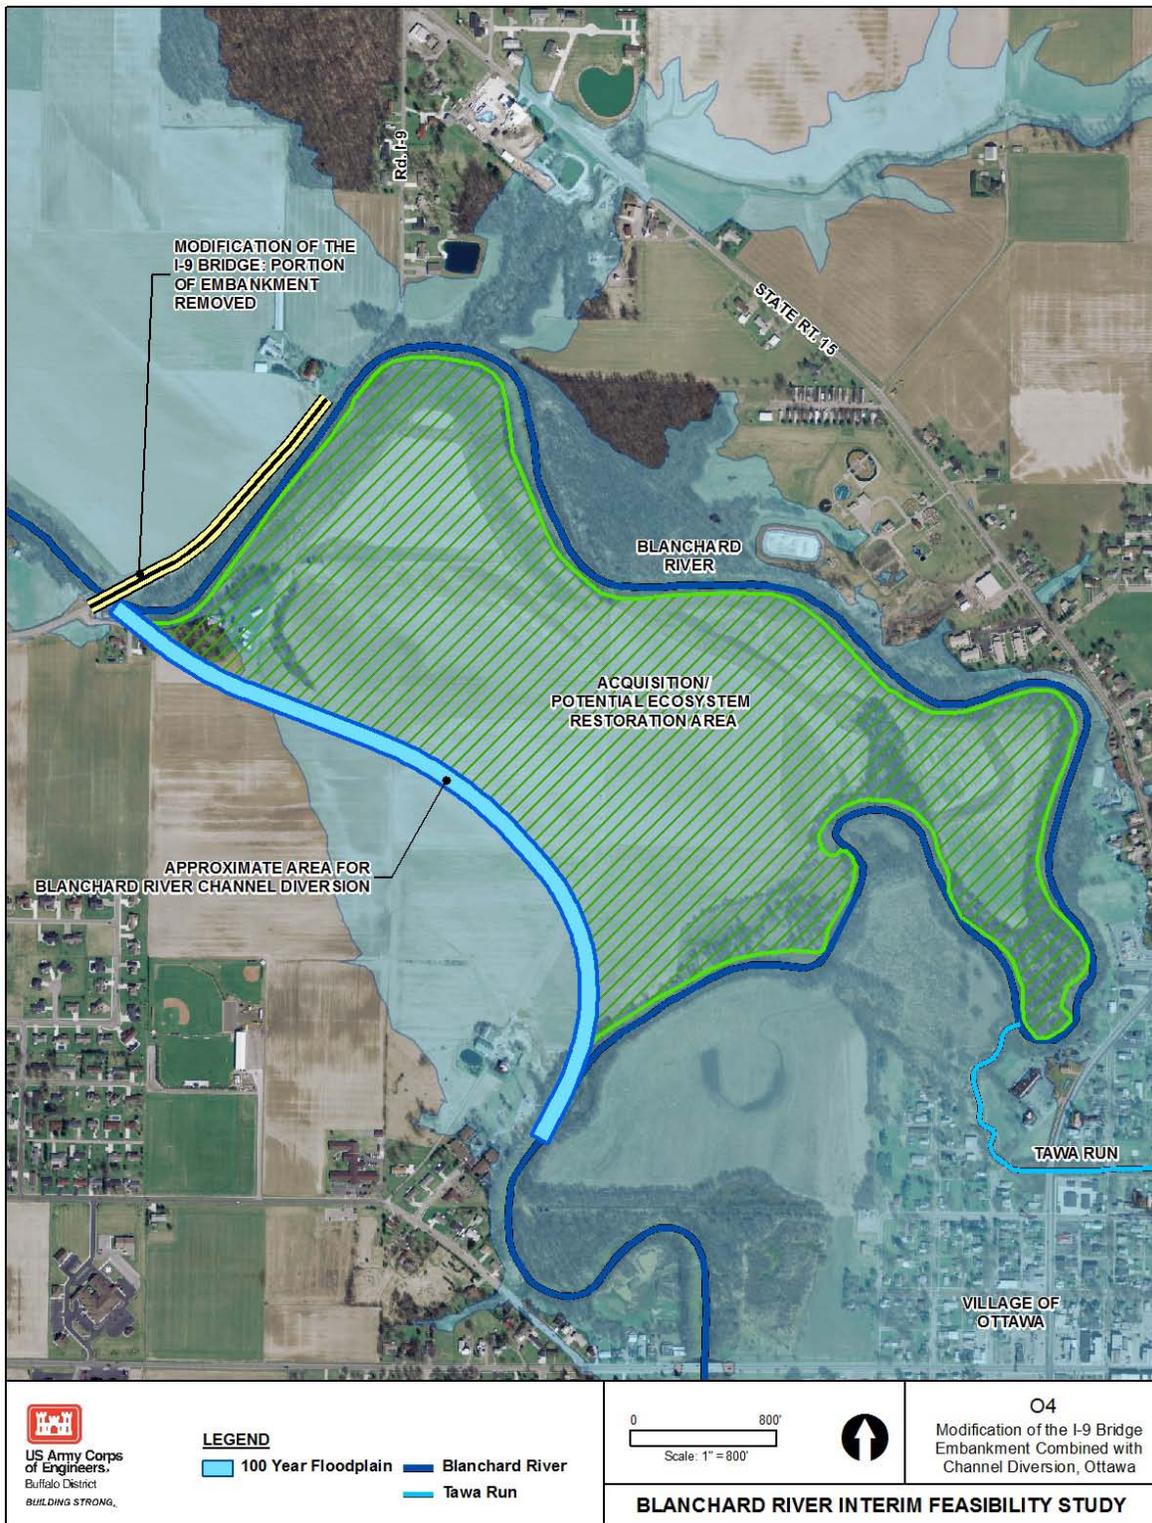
Alternative Plan O4. Modification of the I-9 Bridge embankment combined with Channel Diversion in Ottawa, OH.
